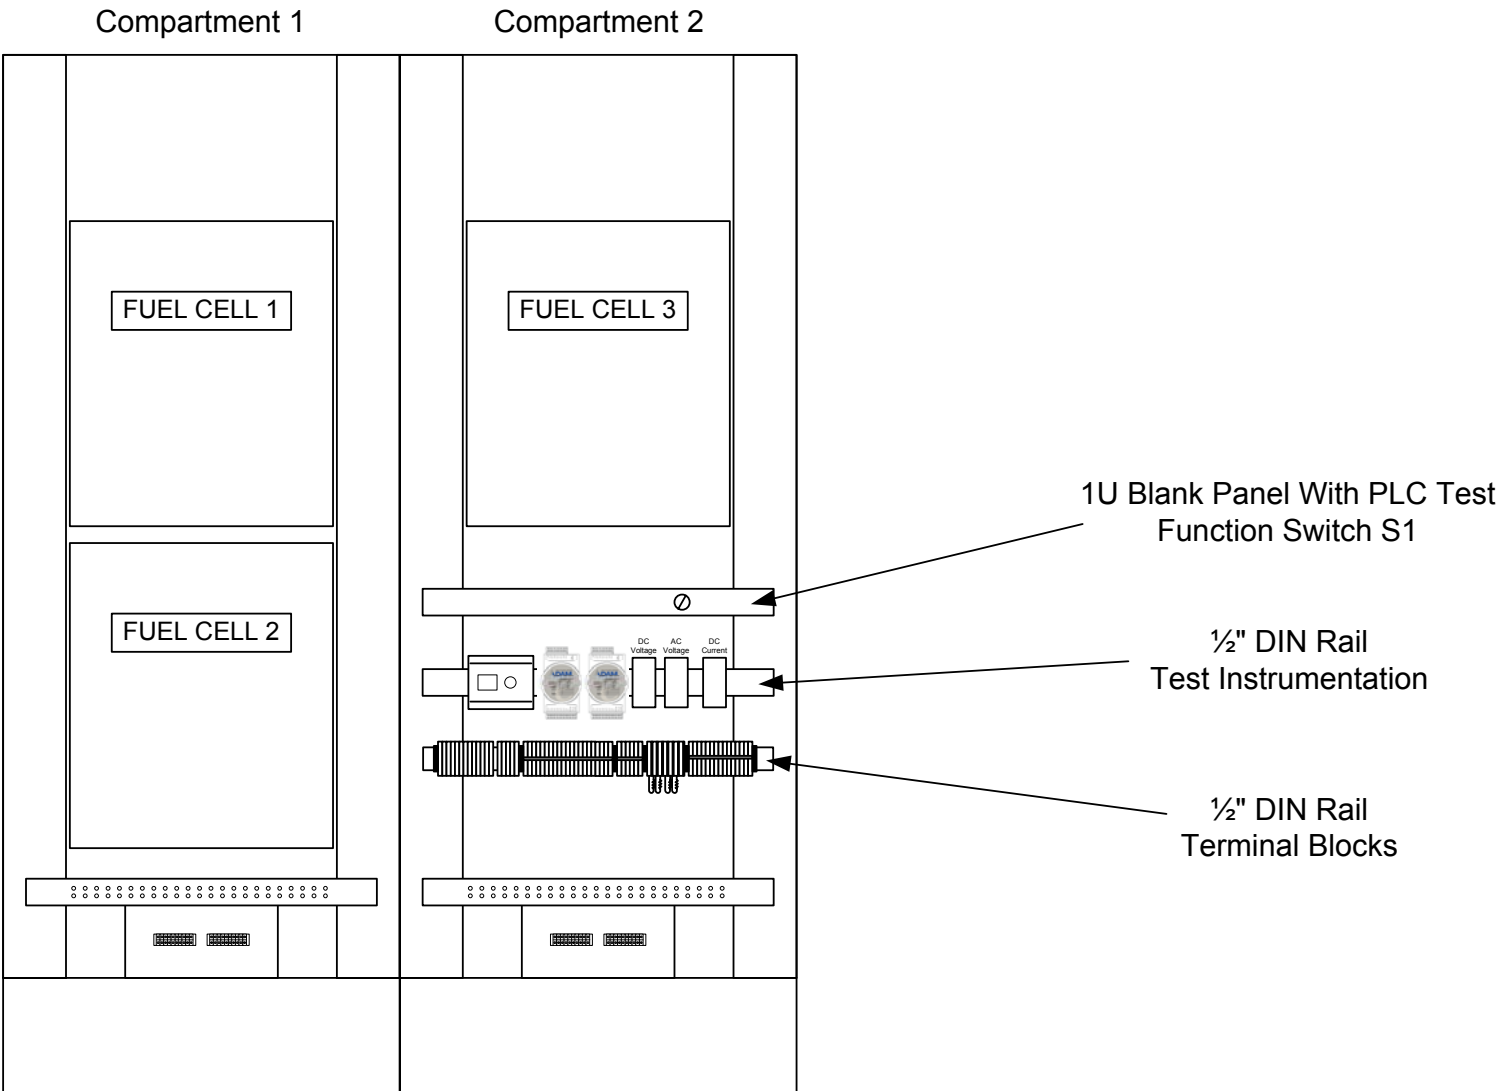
TEST INSTRUMENT DIN RAIL PLACEMENT
